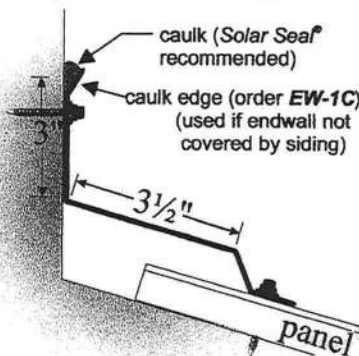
As with the ridge cap, the ENDWALL FLASHING above is sealed using outside closures.
